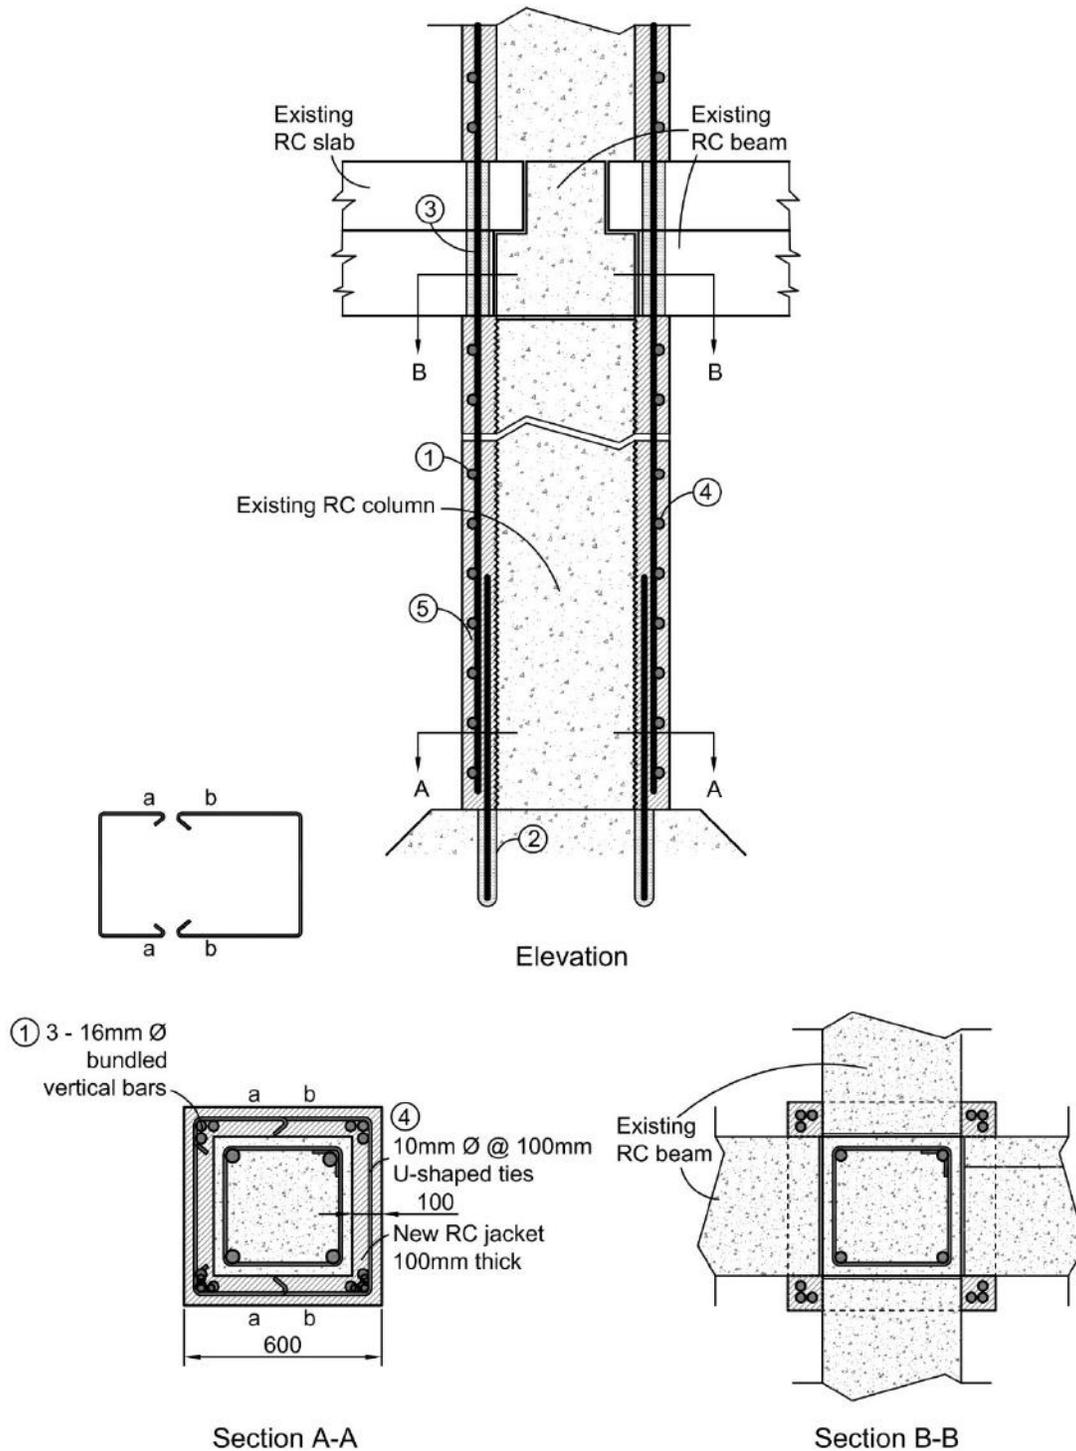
Construction details for retrofit scheme with new RC column with RC jacketing (RS1): 1 – longitudinal jacket reinforcement (3 bundled bars at each corner); 2 – anchorage of bars into the existing footing; 3 – drilled holes through the existing beam to enable continuity of jacket reinforcement; 4 – new U-shaped ties; 5 – new RC jacket.
